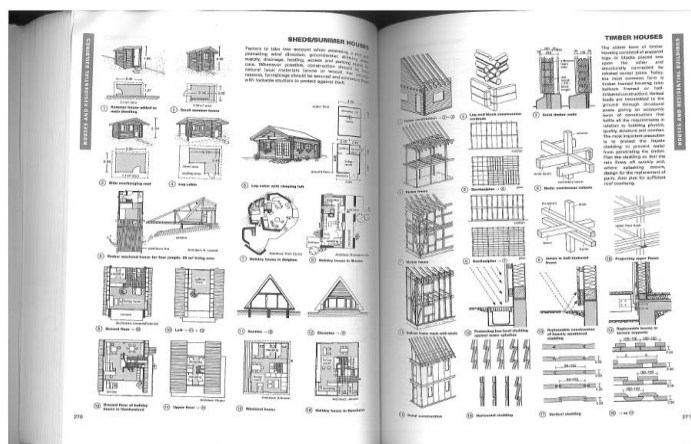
Examples of architectural works of pure engineering conception taken from fundamental architectural works: cottage and summer house design.
